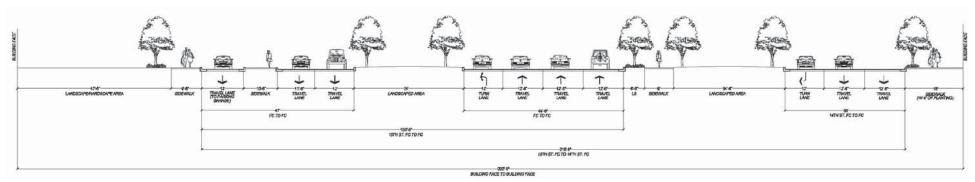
Existing cross-section looking west of 15th Street S. and 14th Street S. to the west of Jefferson Davis Highway
